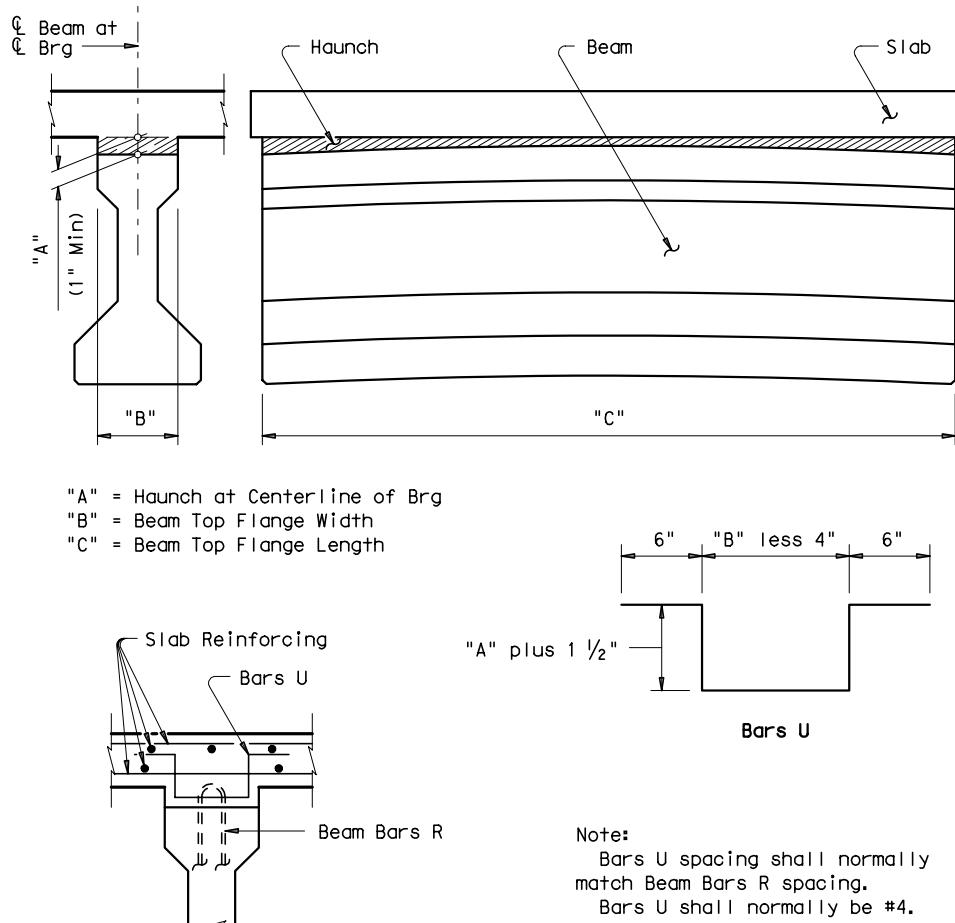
Beam Haunch Details. Online users can click 5-17 to view this illustration in PDF.
